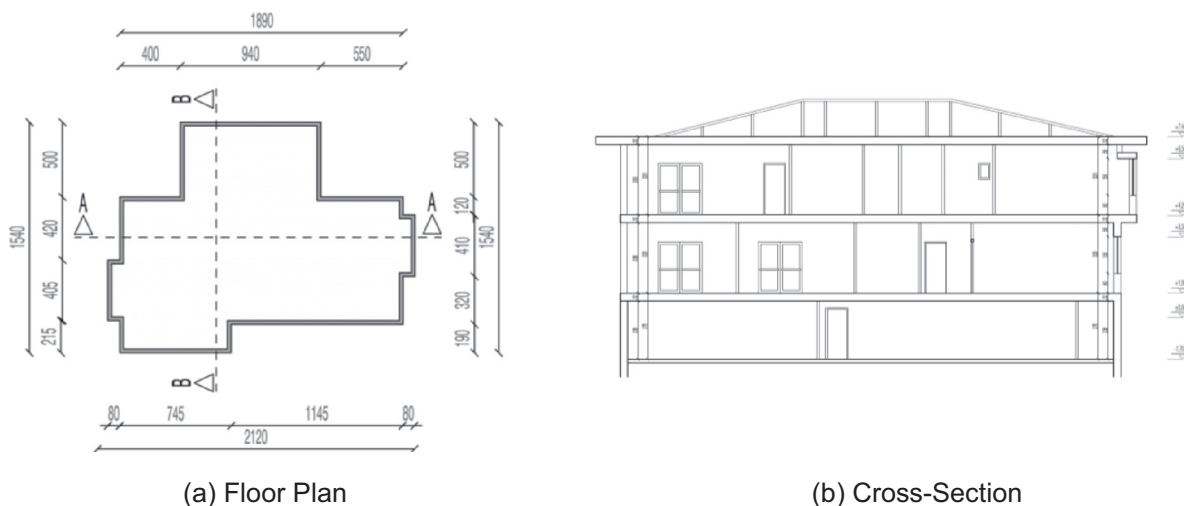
The floor plan (a) and cross-section (b) of the test house.
